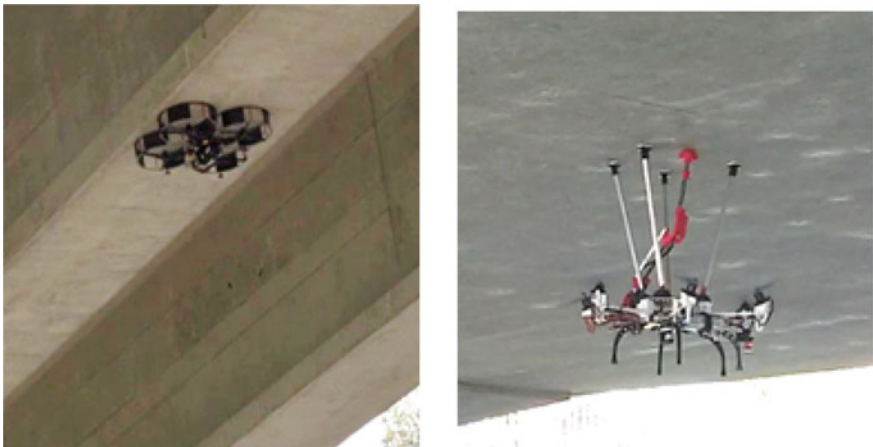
(left) ARBI (aerial robot for bridge inspection) developed in the AEROBI project; (right) FAIR (fully-actuated inspection robot) first proof of concept for RESIST con-tact inspection
